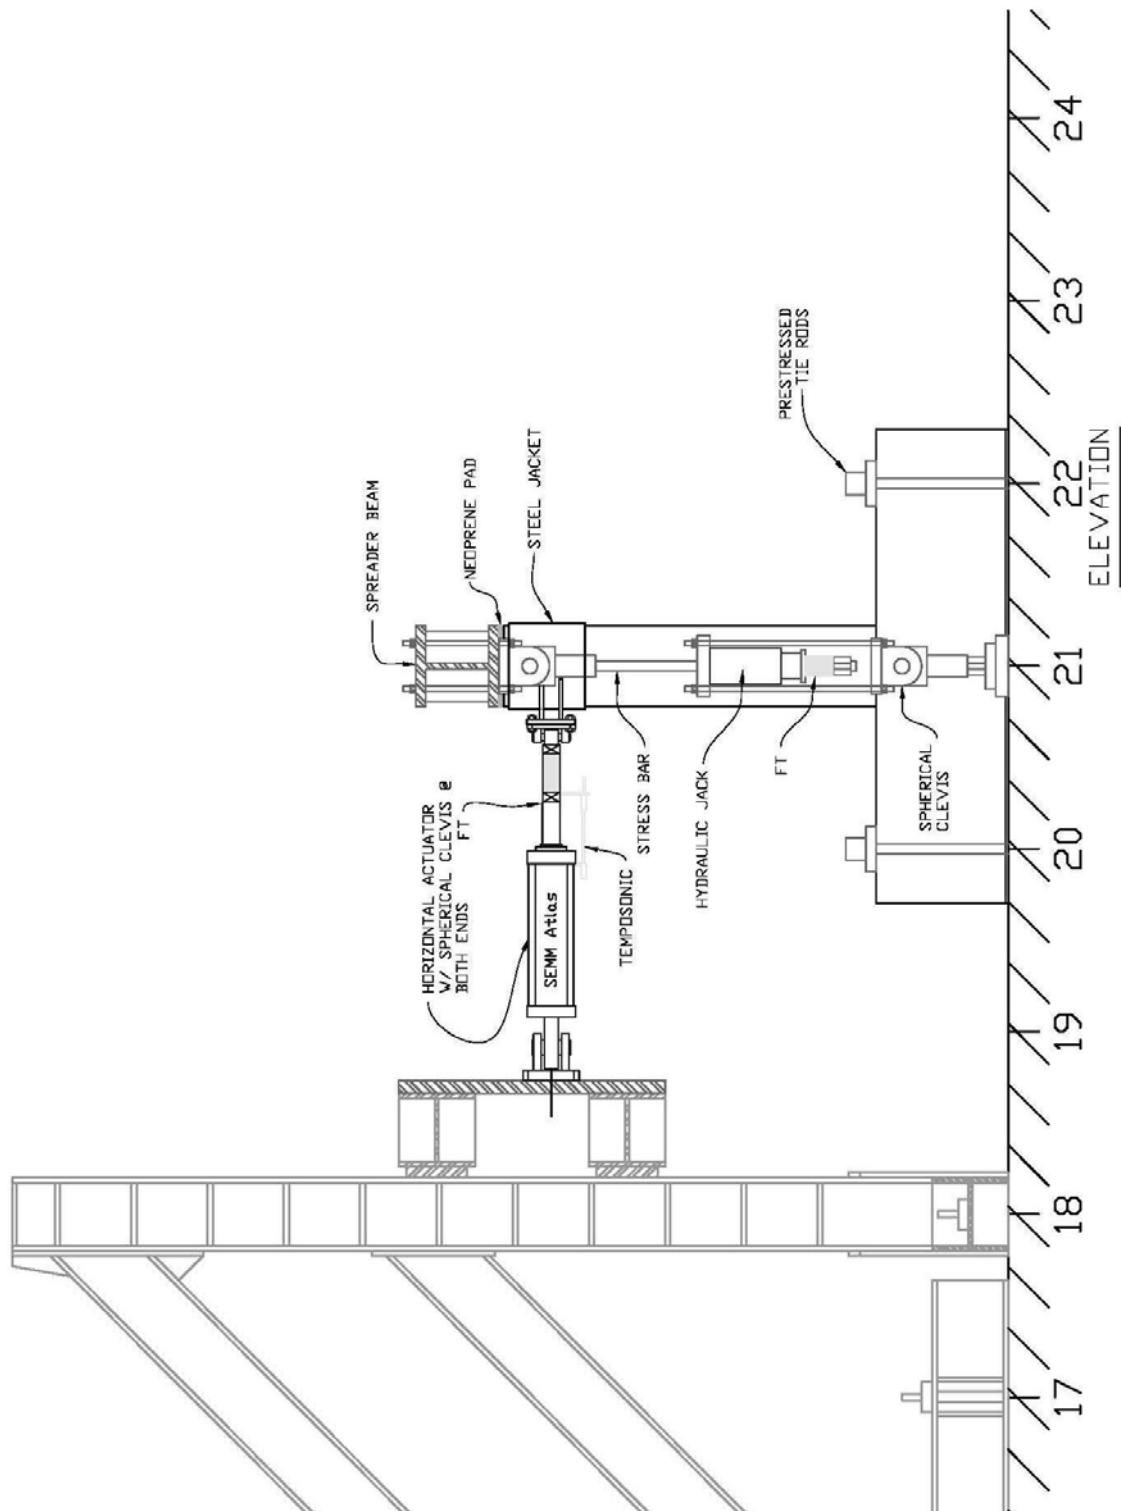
South view of experimental setup of FRC column specimen subjected to bidirectional cyclic loading
